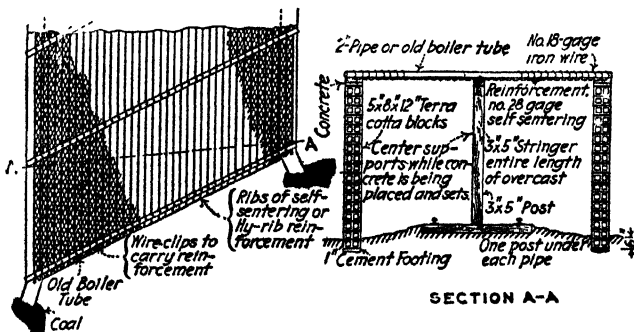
The Consolidation Coal Co.'s reinforced concrete, hollow tile overcast with flat roof.
